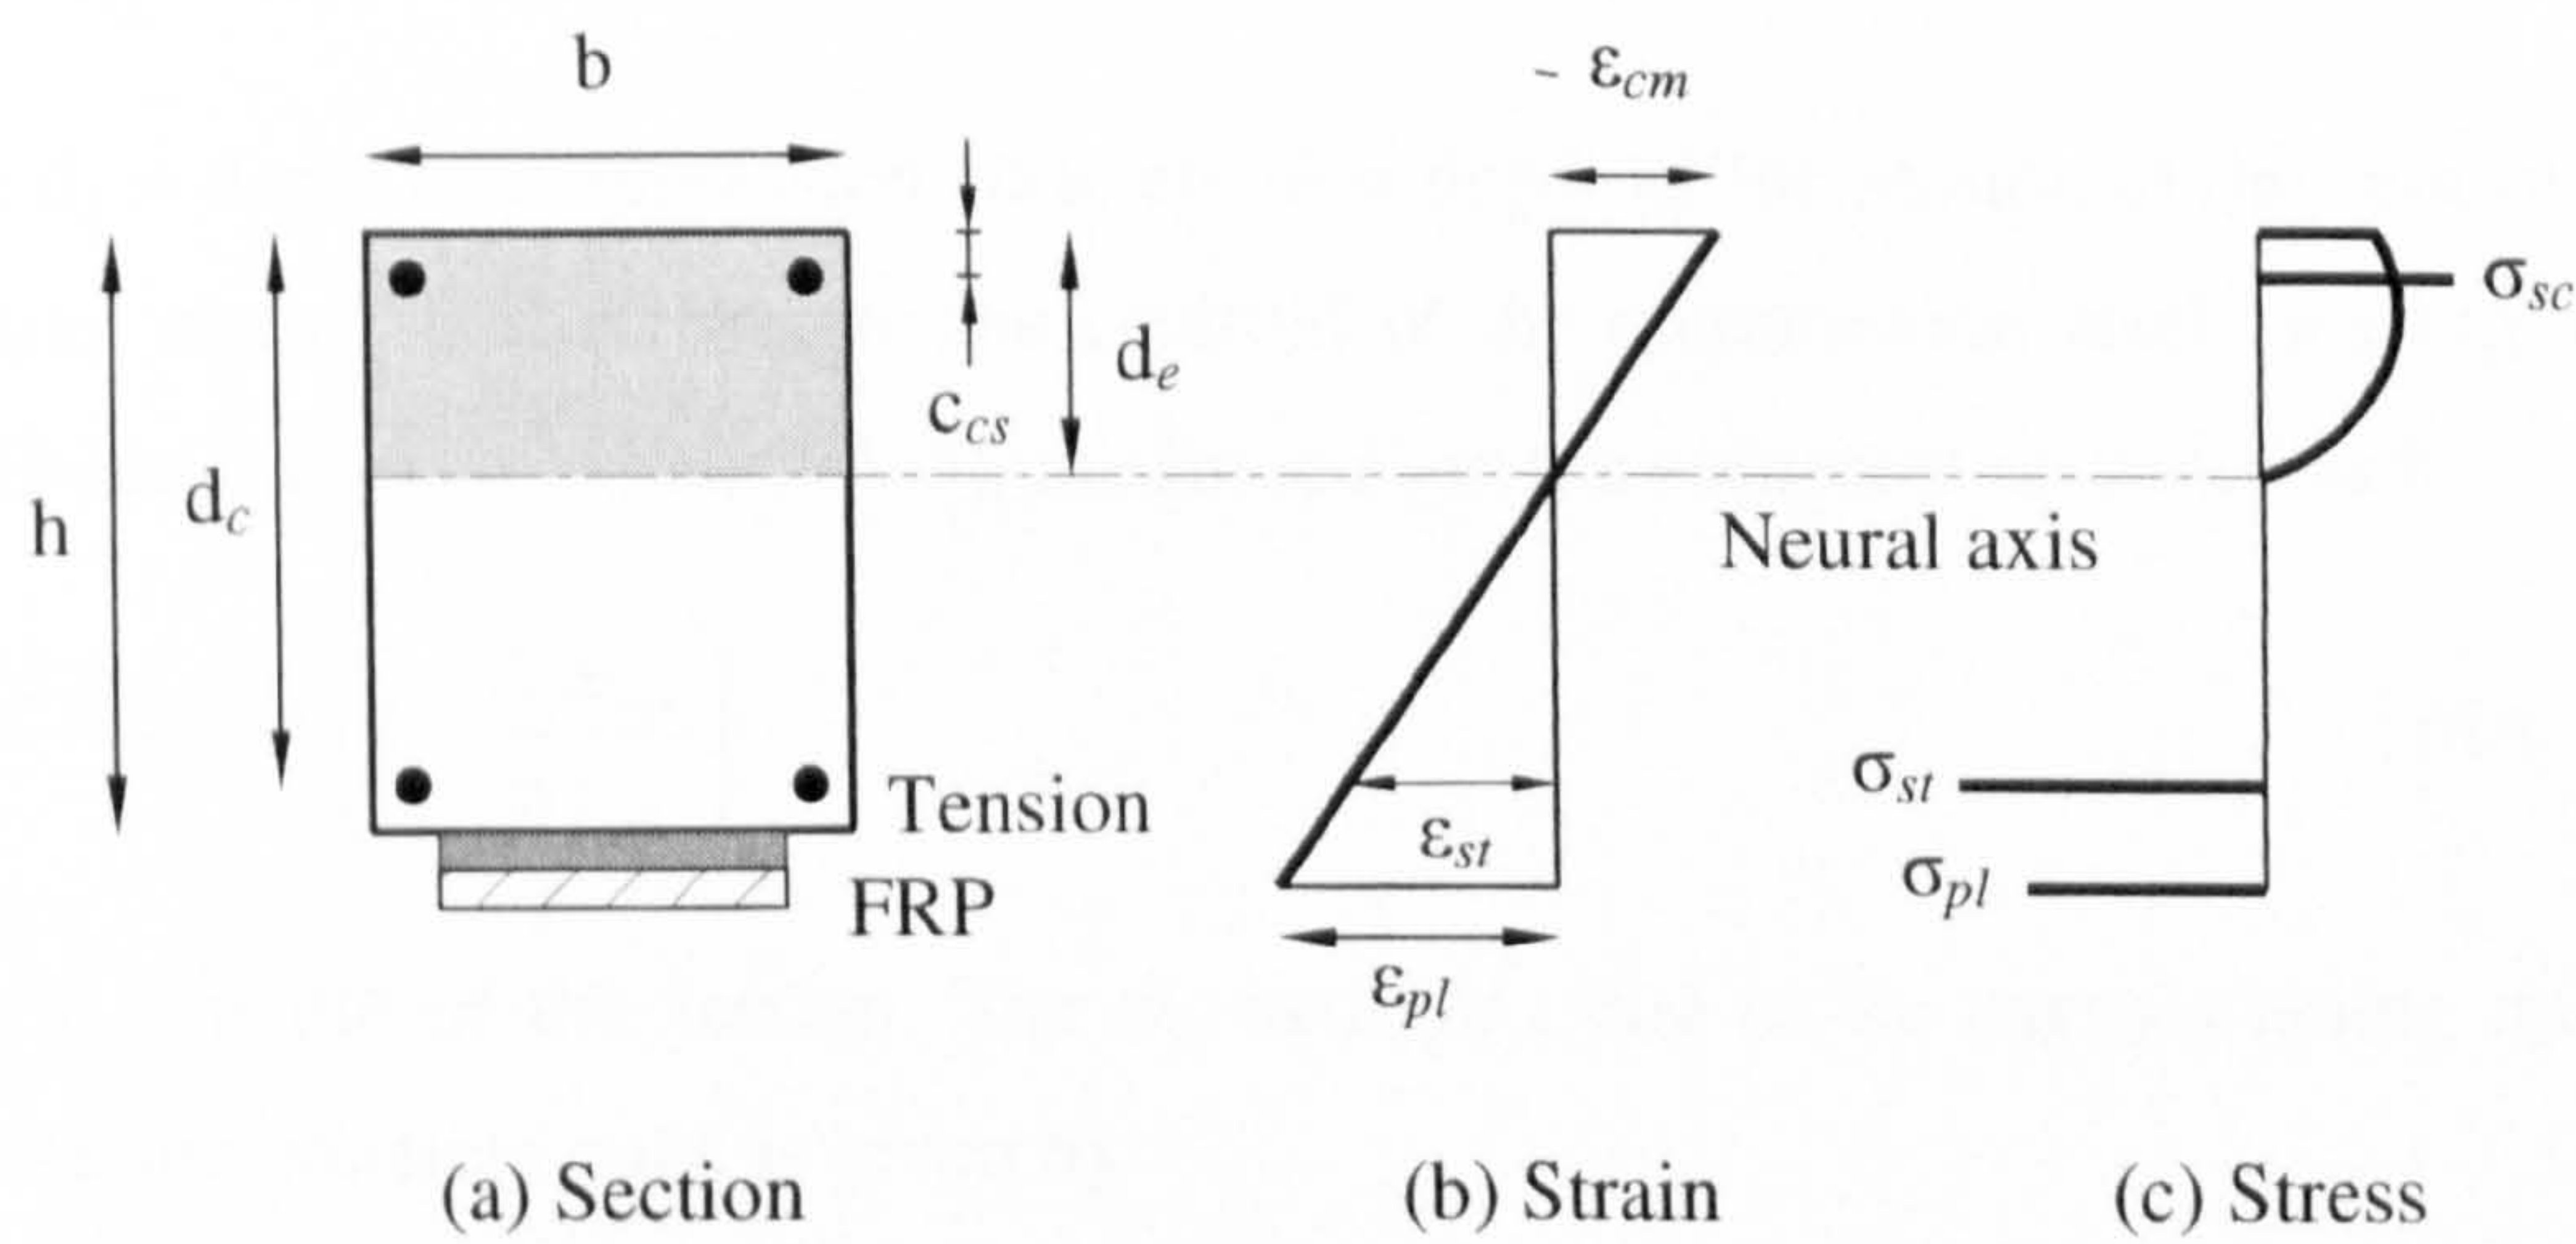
A-1 - Through depth strains and stresses in plated reinforced concrete section
